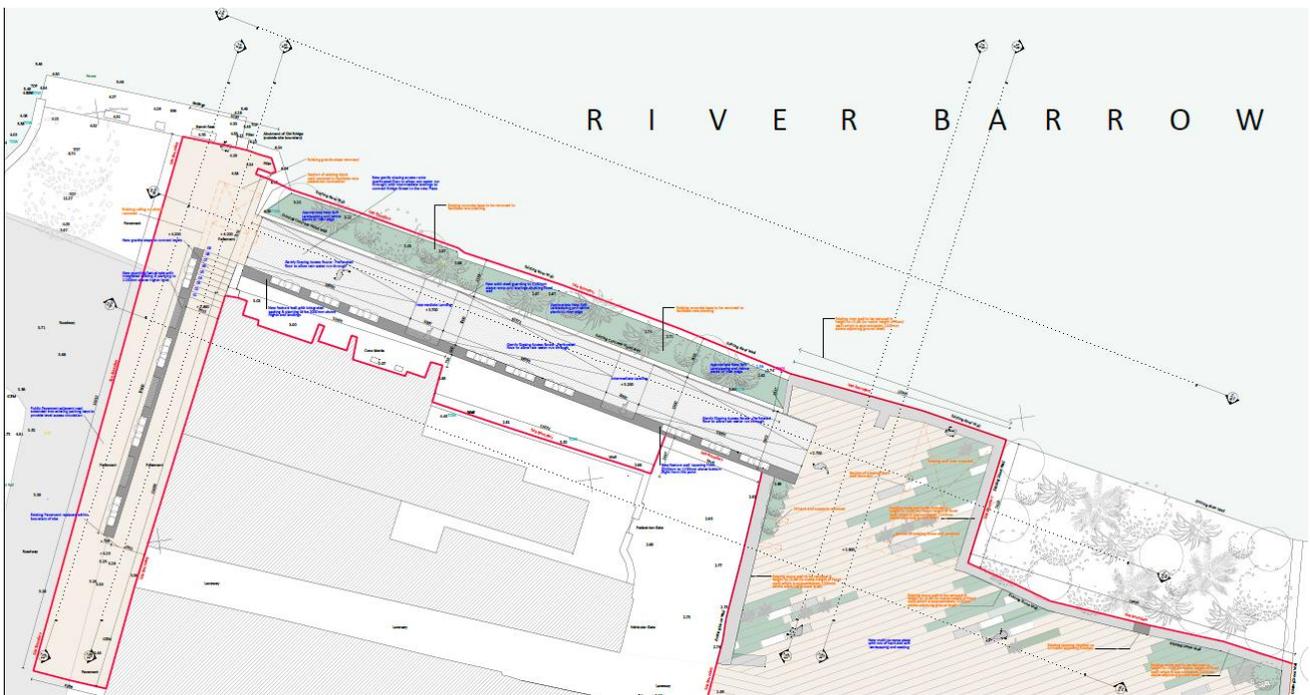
Proposed Site Layout Plan (Source: ODKM Architects)
